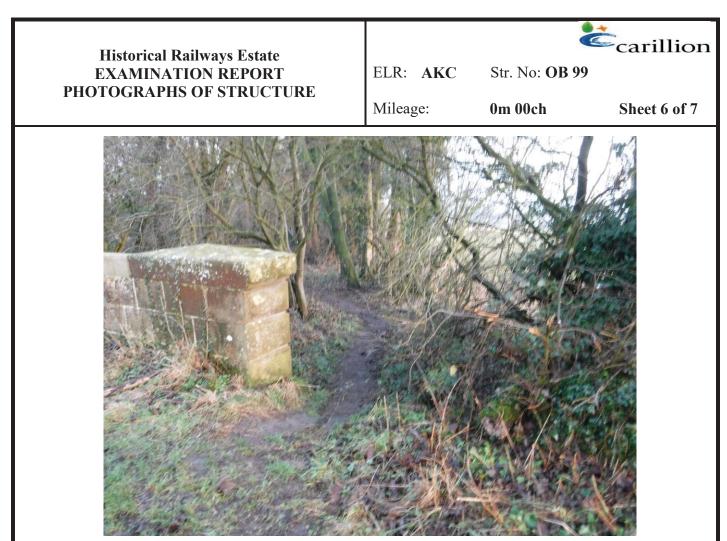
Approach road walling: Typical example of the condition at S/E end.
